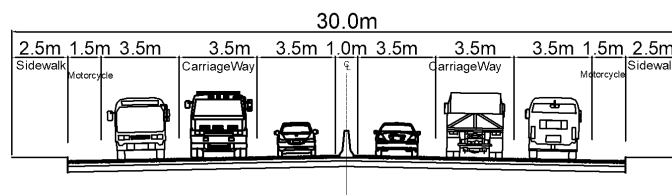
Six-lane Widening Section and Alternative Bypass
